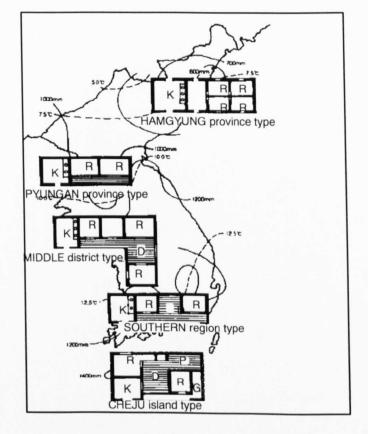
Floor plan of Korean traditional folk houses based on Joo's classification. (R) room; (K) kitchen; (D) Daechung (main wooden-floor room); (J) Jeongjugan (store); (P) Gopang (store); (G) Gulmok (fire house), and (C) Chuckdam (buffer space)
